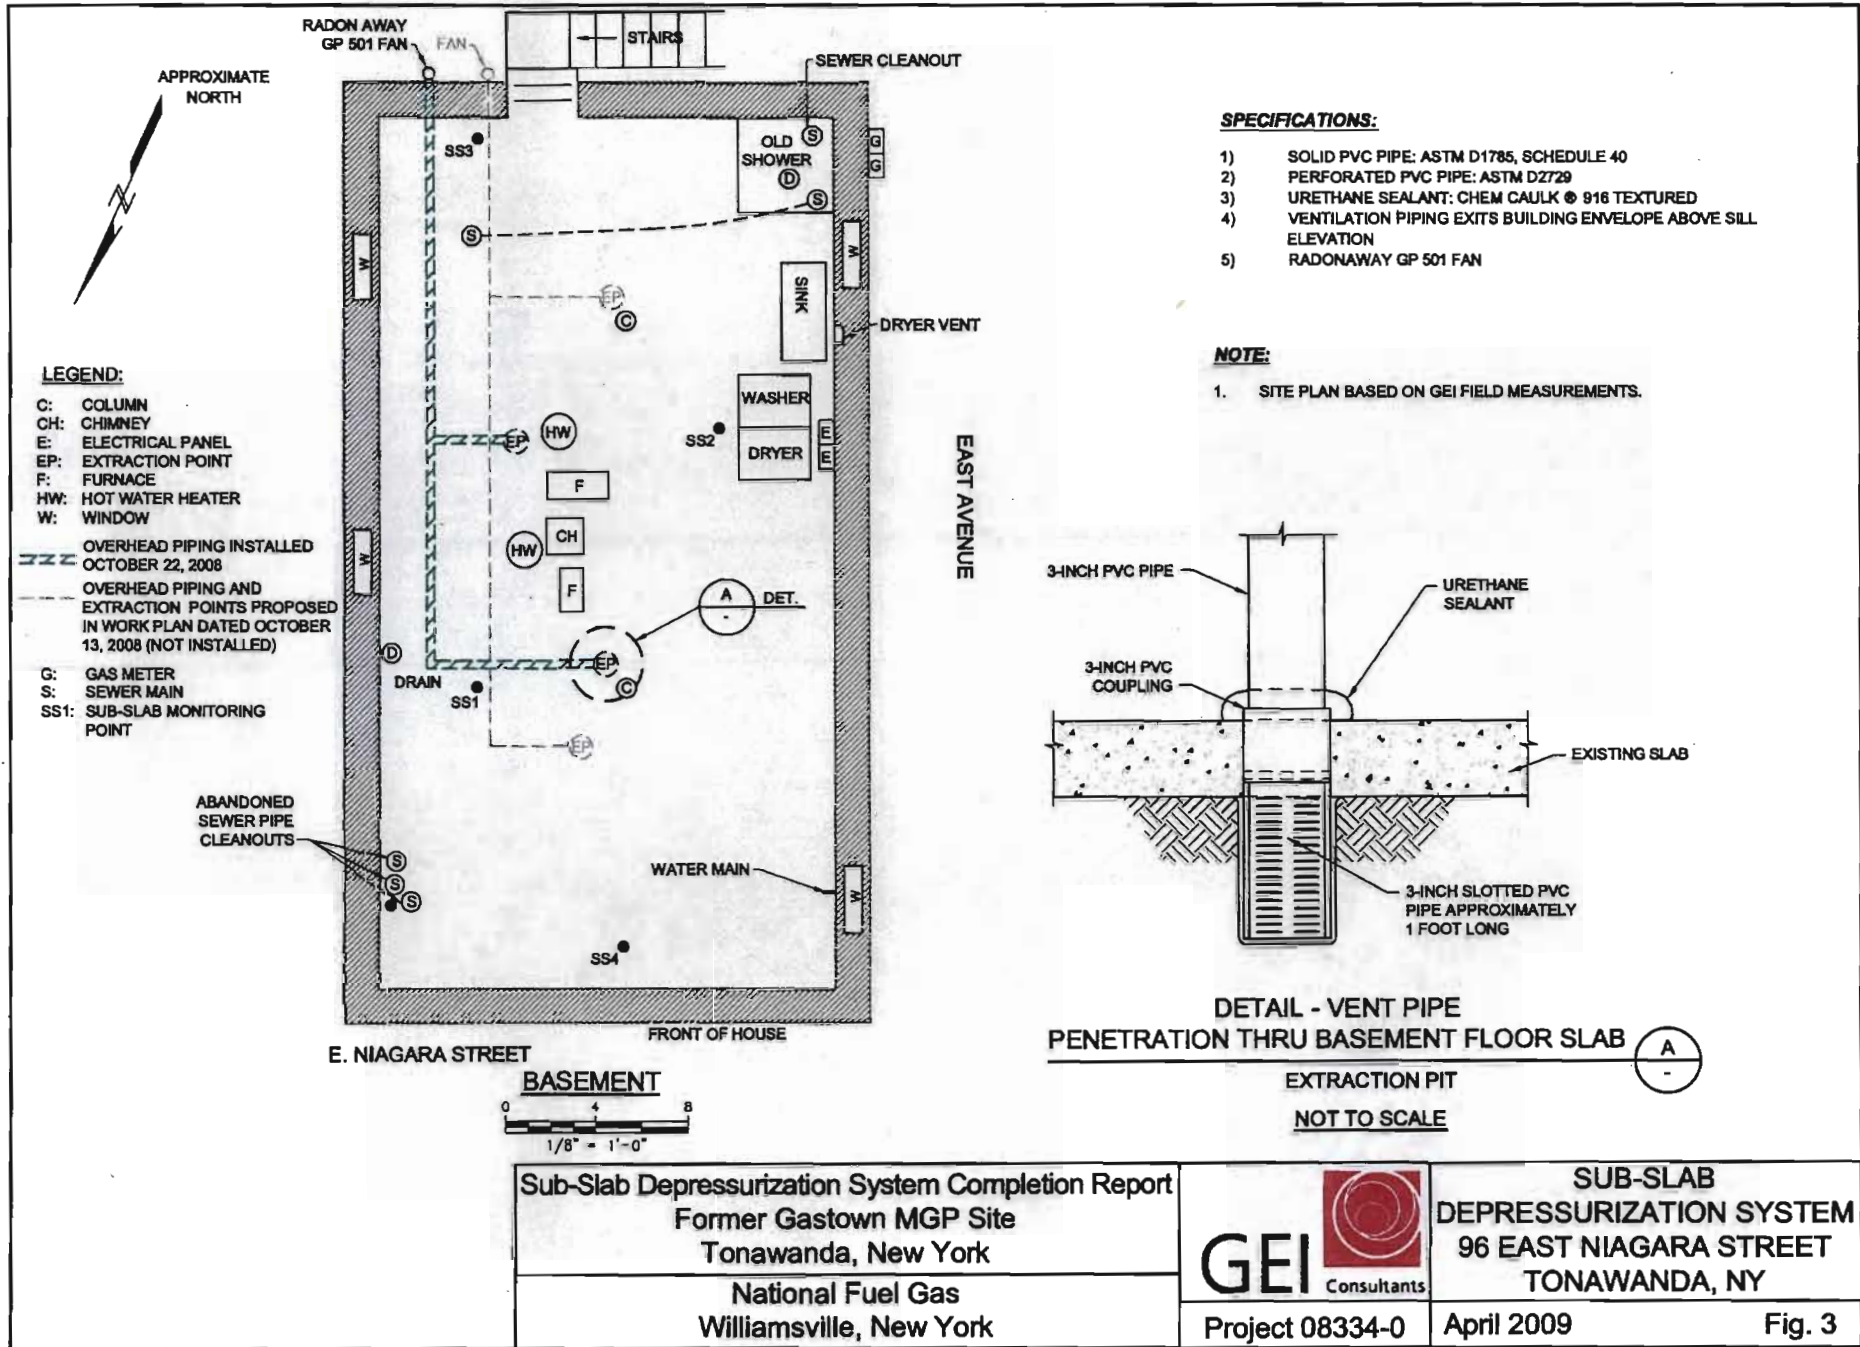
DETAIL - VENT PIPE PENETRATION THRU BASEMENT FLOOR SLAB
